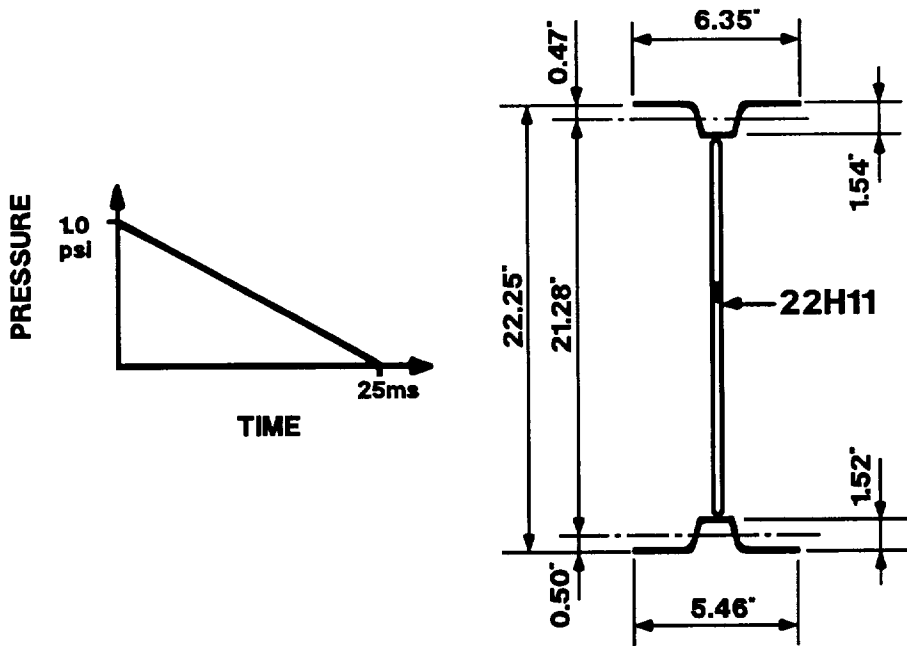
A-5(b) Joist cross-section and loading, Example 5A-5(b)
